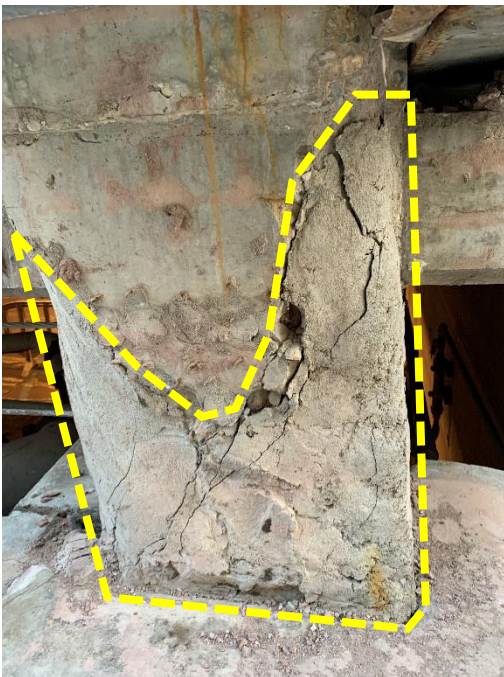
Cracked and unsound previous concrete repair at Column 10A. Eight grout pockets are visible at the ends of the beam PT tendons.
